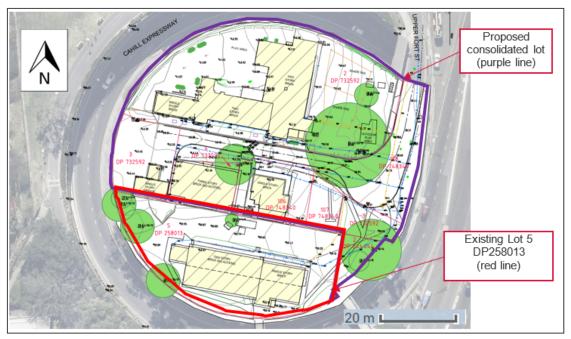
| Proposed lot layout (Source: Applicant's RtS 2020)
